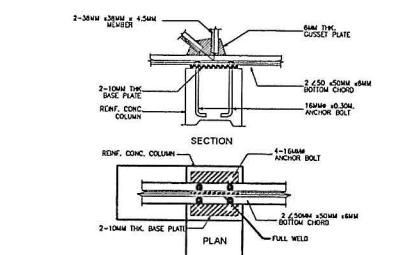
DETAIL OF GUTTER/ CEILING/ EAVES & ANCHORAGE
